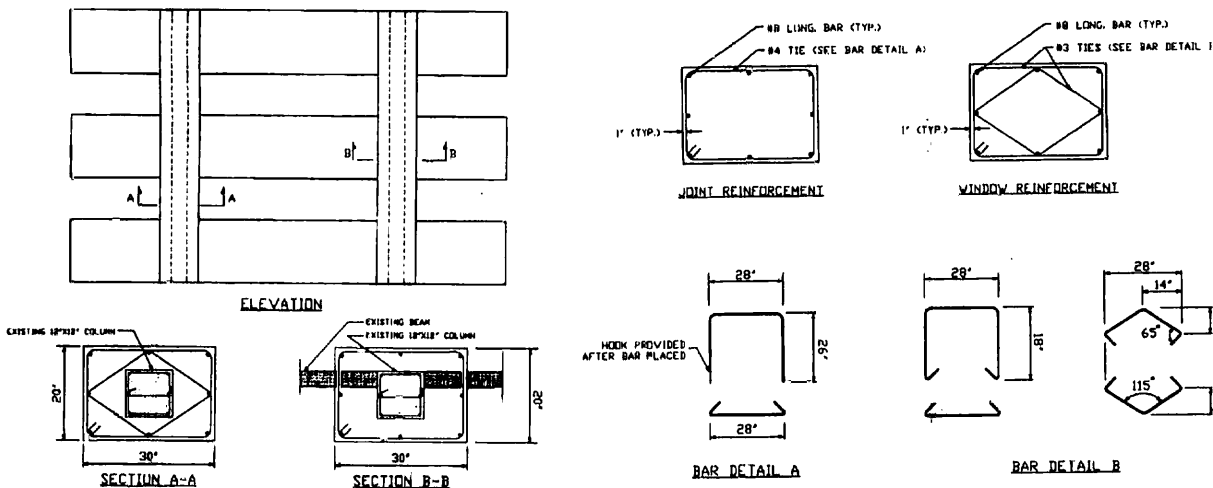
Jackets constructed around columns in 2:3 scale 2-storey, 1-bay test frame by Stoppenhagen et al (1995).
